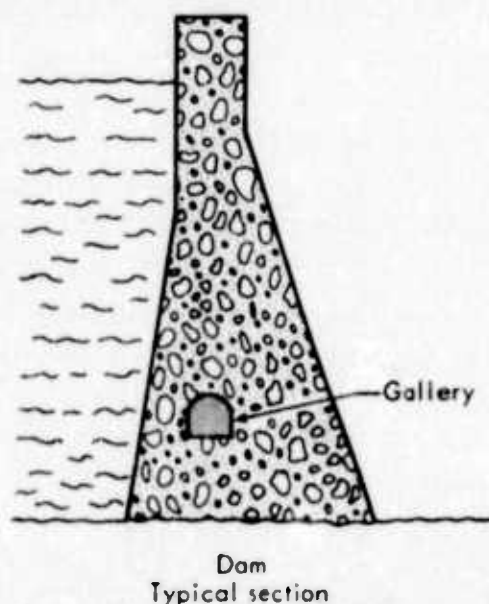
Inspection gallery of dam used as explosive emplacement cavity.
